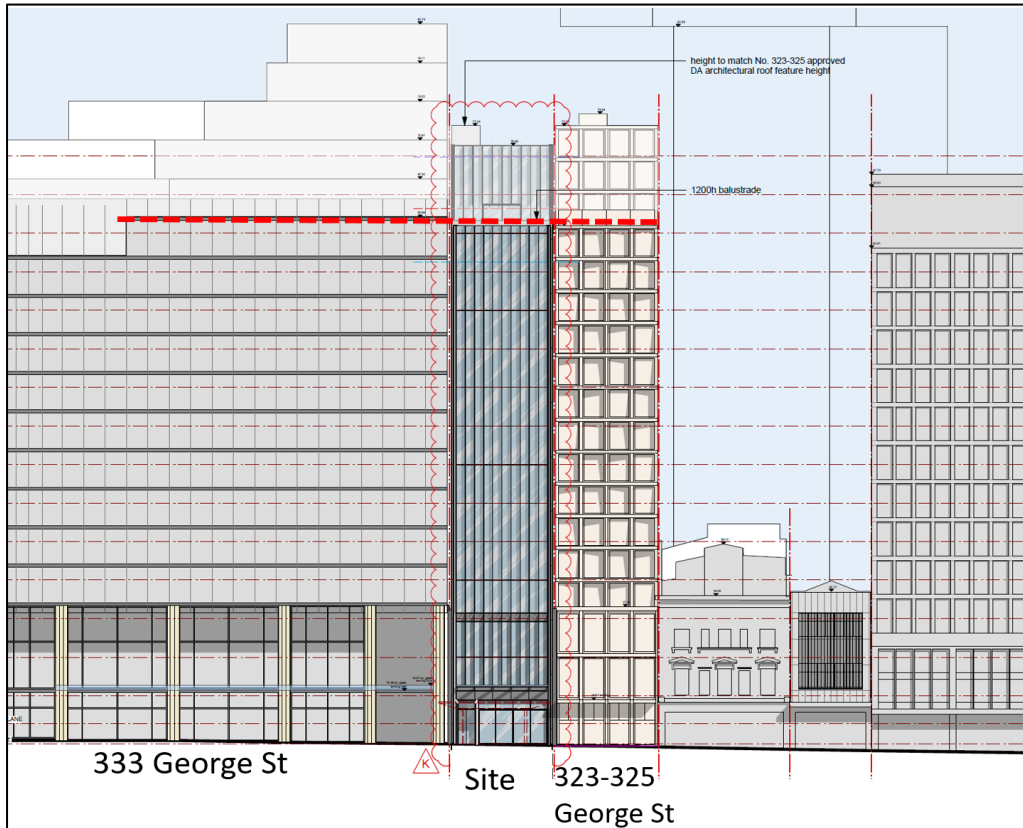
George Street elevation with dotted red line indicating approximate street frontage height
